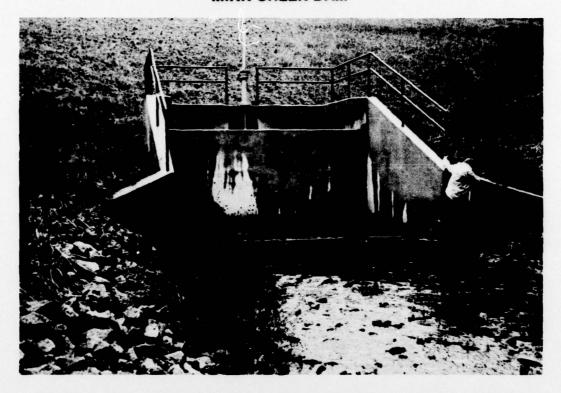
Impact Basin Showing Baffle Wall, End Sill and Riprapped Exit Channel
